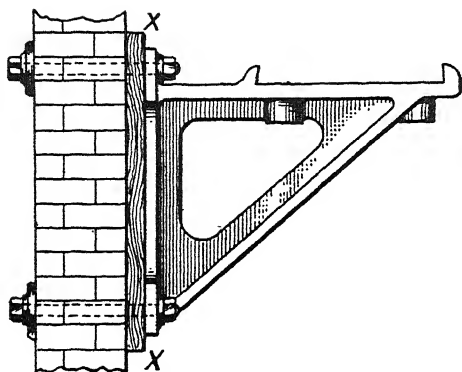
To GIVE A LEVEL WALL SURFACE
